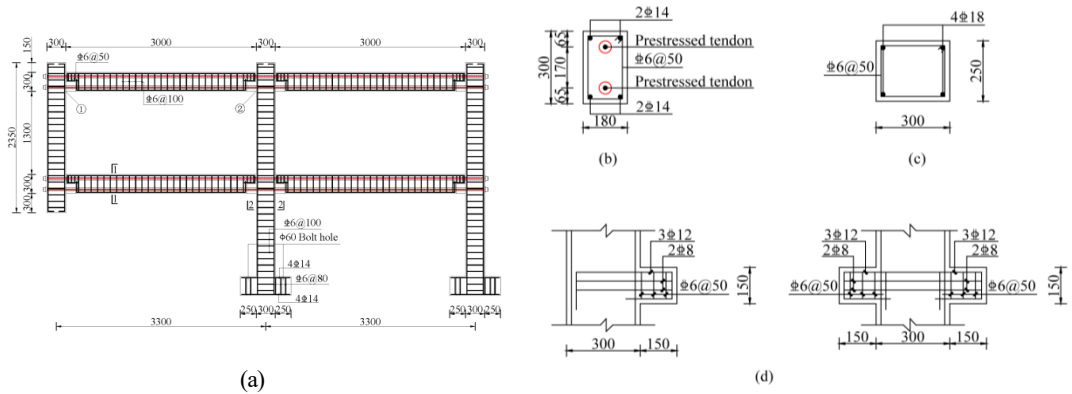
Geometry and reinforcement detailing of the specimen (unit: mm): (a) The prestressed fabricated concrete frame; (b) section 1-1; (c) section 2-2; (d) local amplification.
